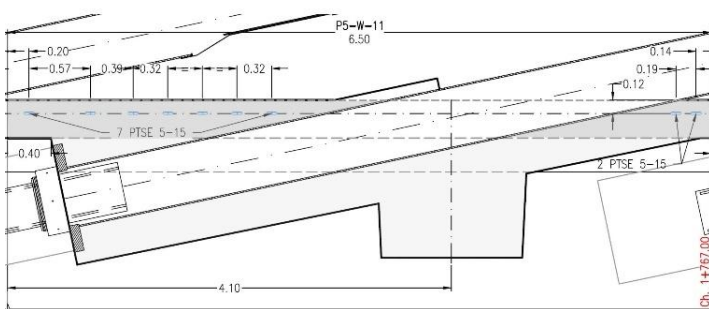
Longitudinal cross section at the central line for a typical segment in Span 4 and 5
